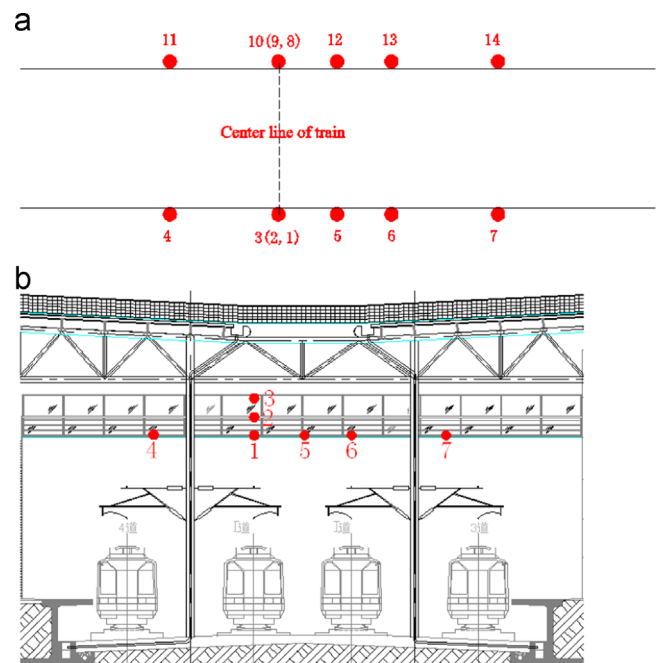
Layout of field measuring points. (a) Top view of the sensor arrangement. (b) Elevation of the sensor arrangement.
